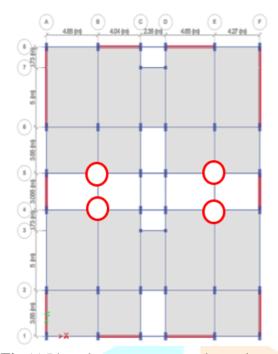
Plan view G+12 storey alternative two Shear walls two Shear walls
